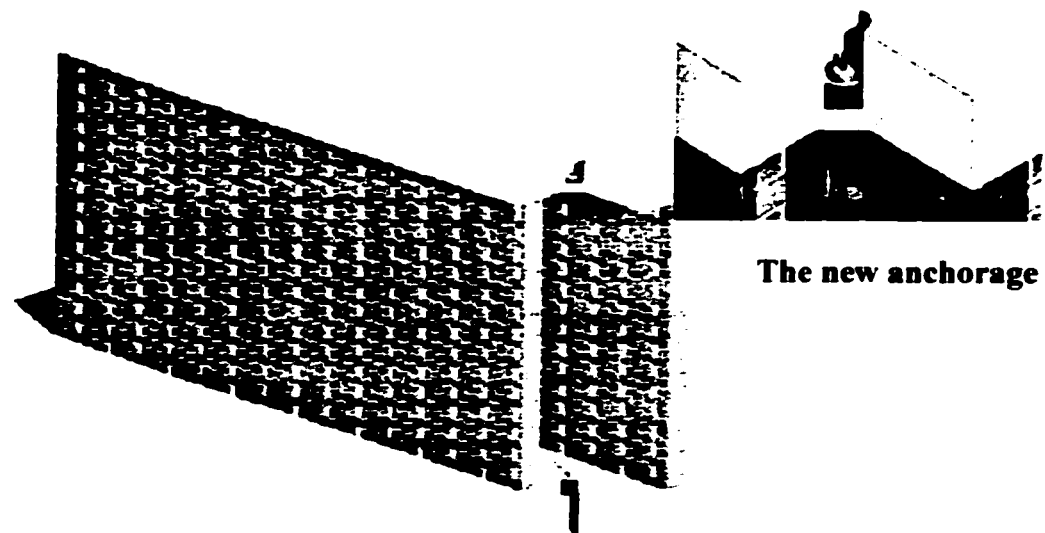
Schematic drawing of the non-metallic anchorage utilized in post-tensioned diaphragm wall.
